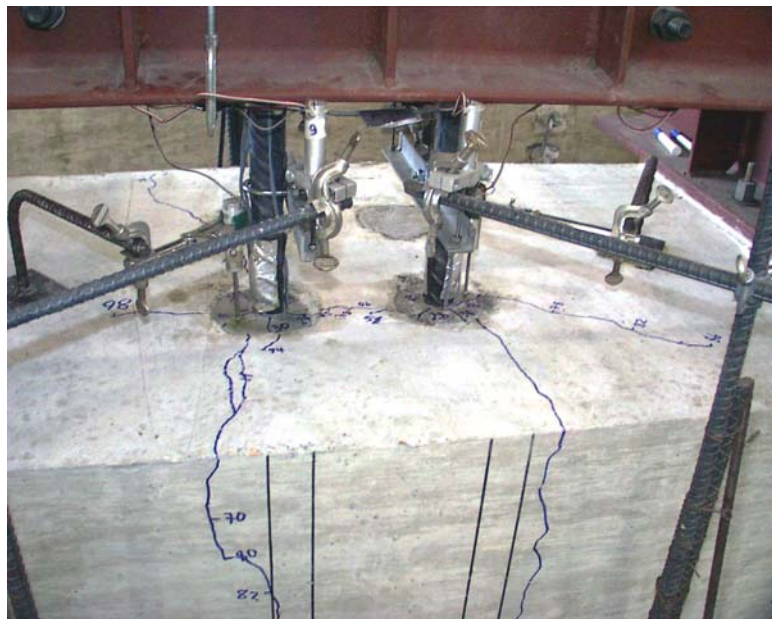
Widespread Splitting Cracks in Test No. 13
